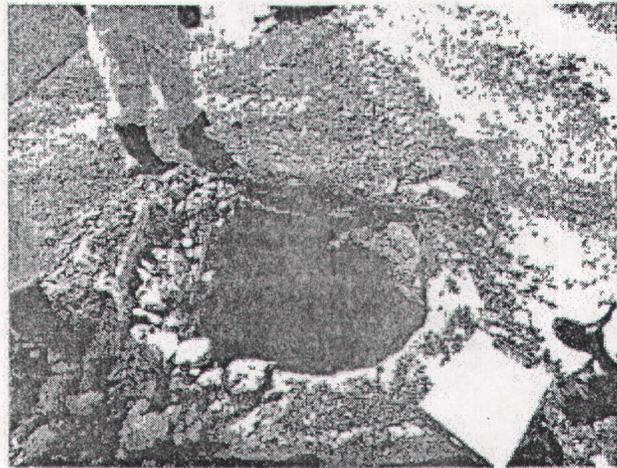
Damaged stormwater collection system catch basin between tracks 2 and 3
